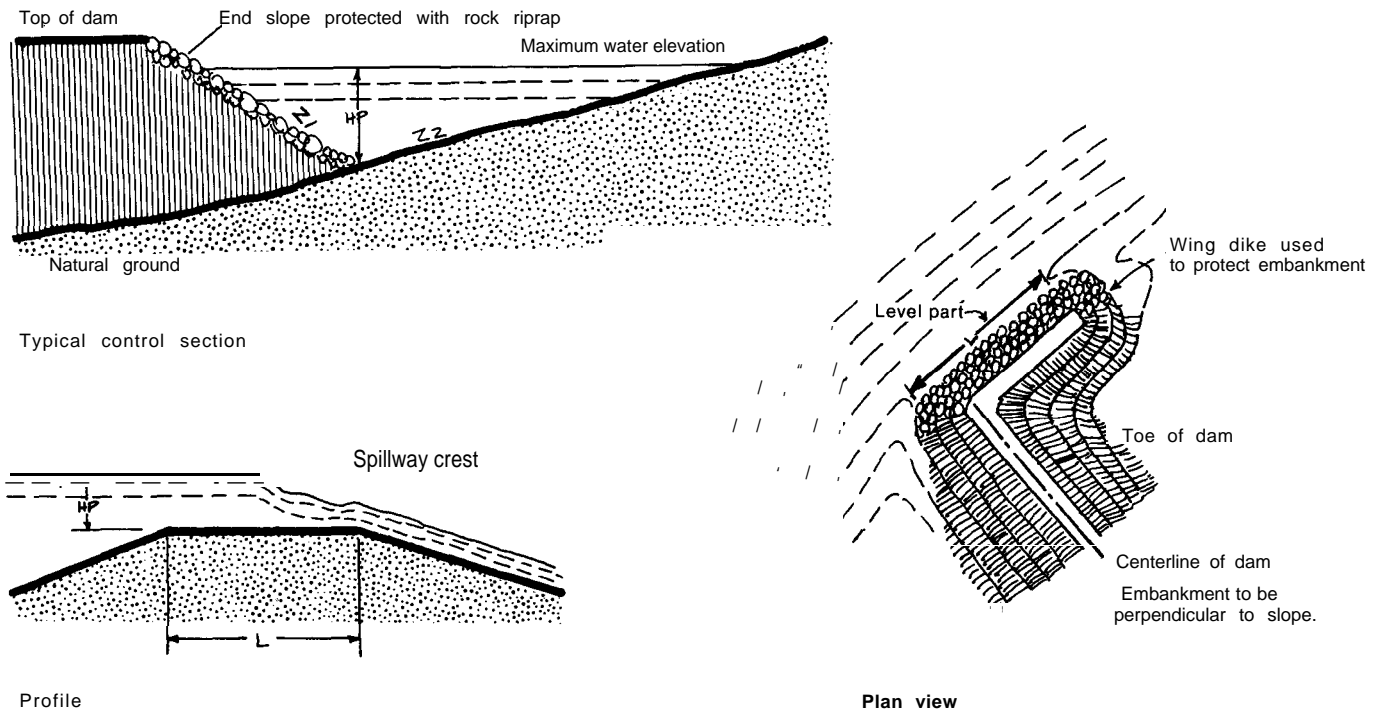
Plan, profile, and cross section of a natural spillway with vegetation.
